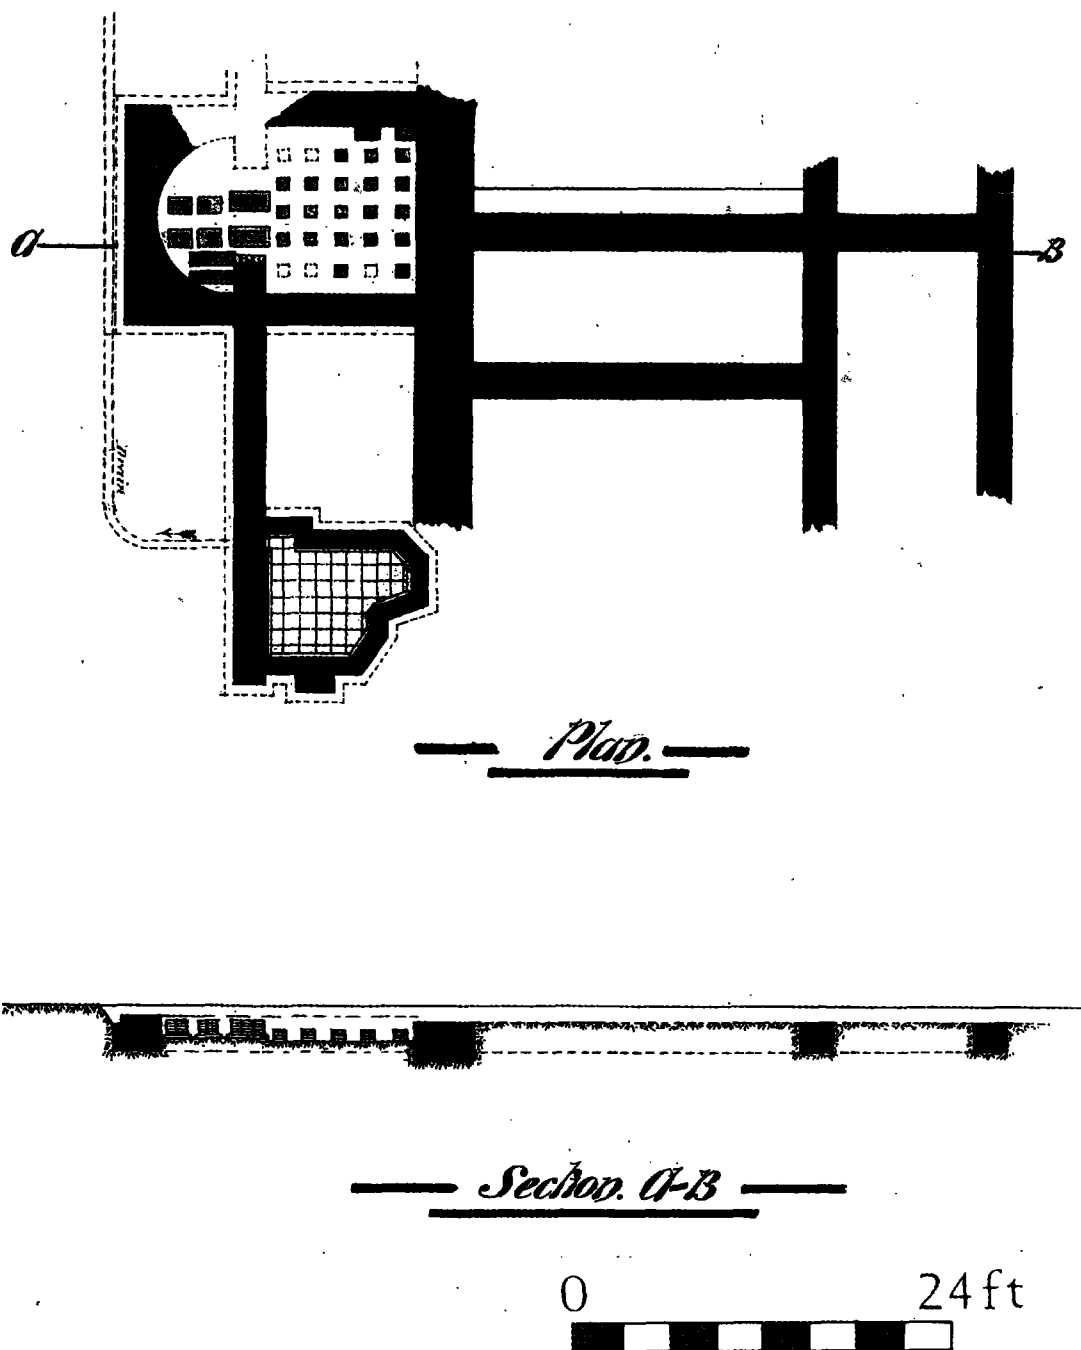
Langstone Avenue: plan and section of the bath suite excavated by Owen Adames
